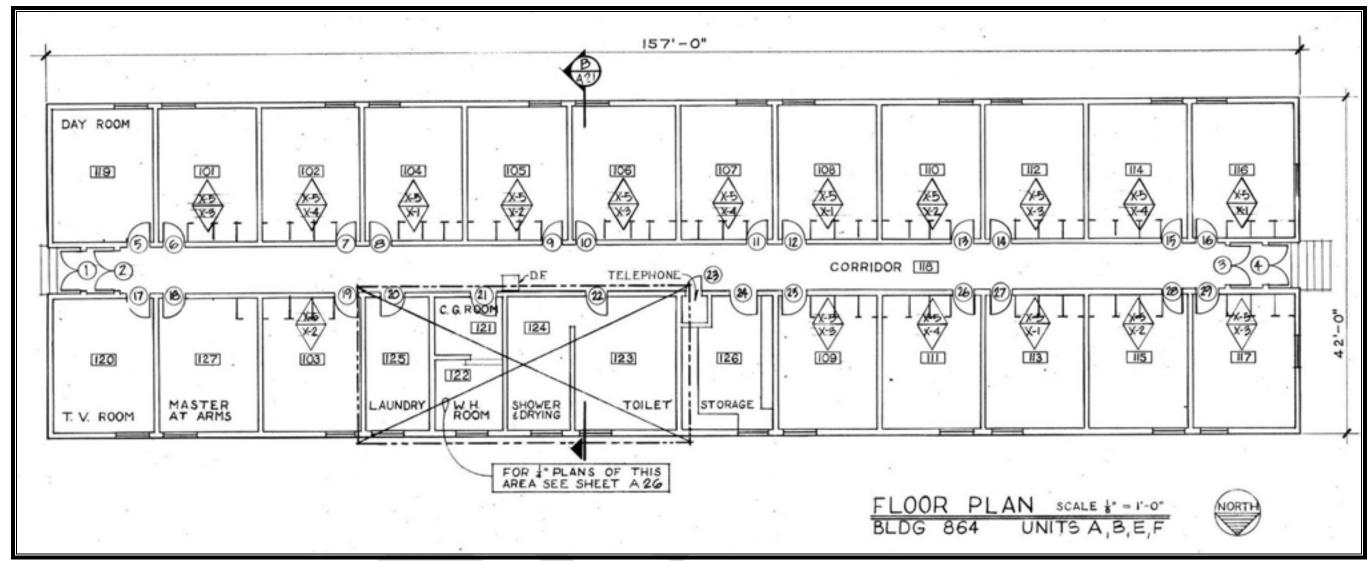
Building 864, 1968 (Courtesy Naval Air Station North Island)
